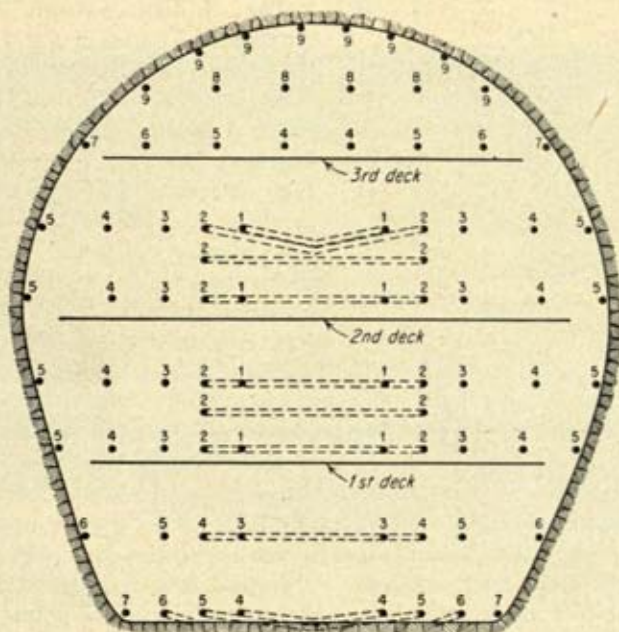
Drilling pattern for the Horetzky-Kemano Tunnel.
